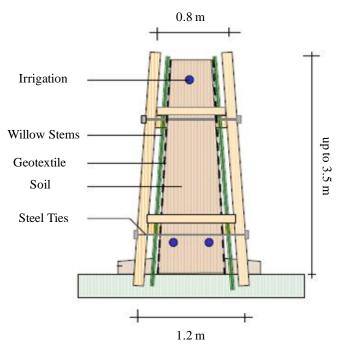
Schematic Diagram of the Living Willow Wall (8)
